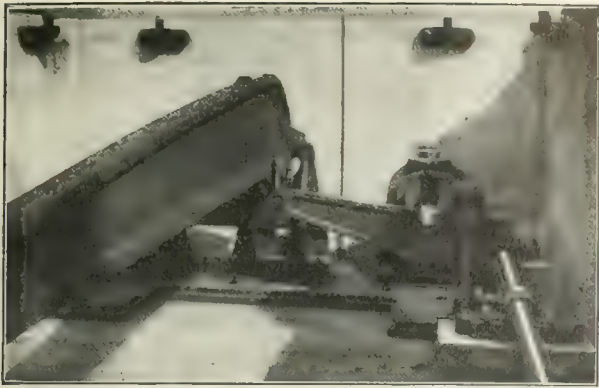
The End Levers, the Torsion Shaft and the End Toggle Jacks of the Relieving Gear.
